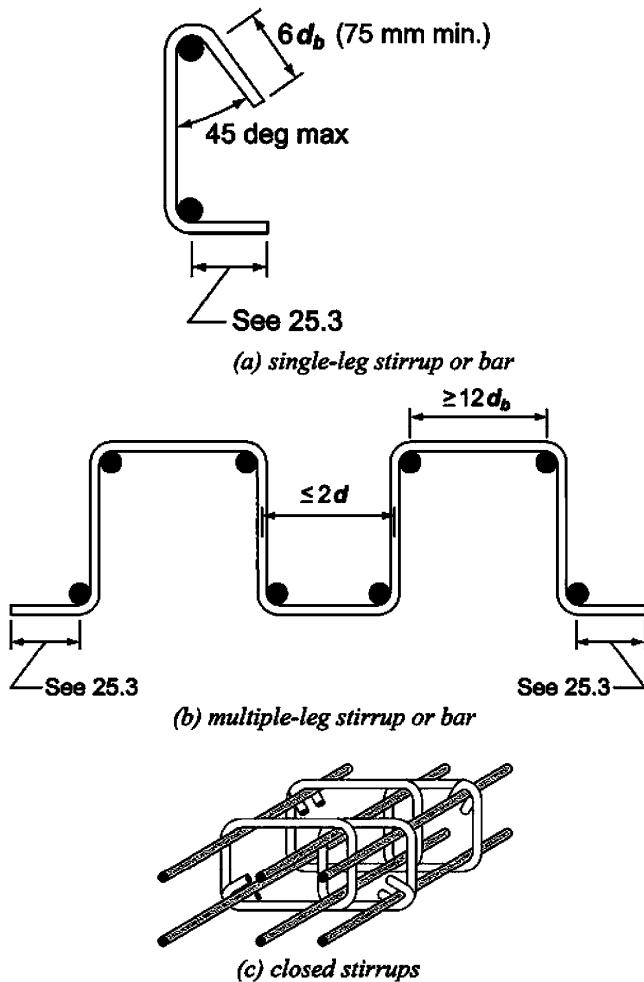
(a)-(c)—Single- or multiple-leg stirrup-type slab shear reinforcement.
